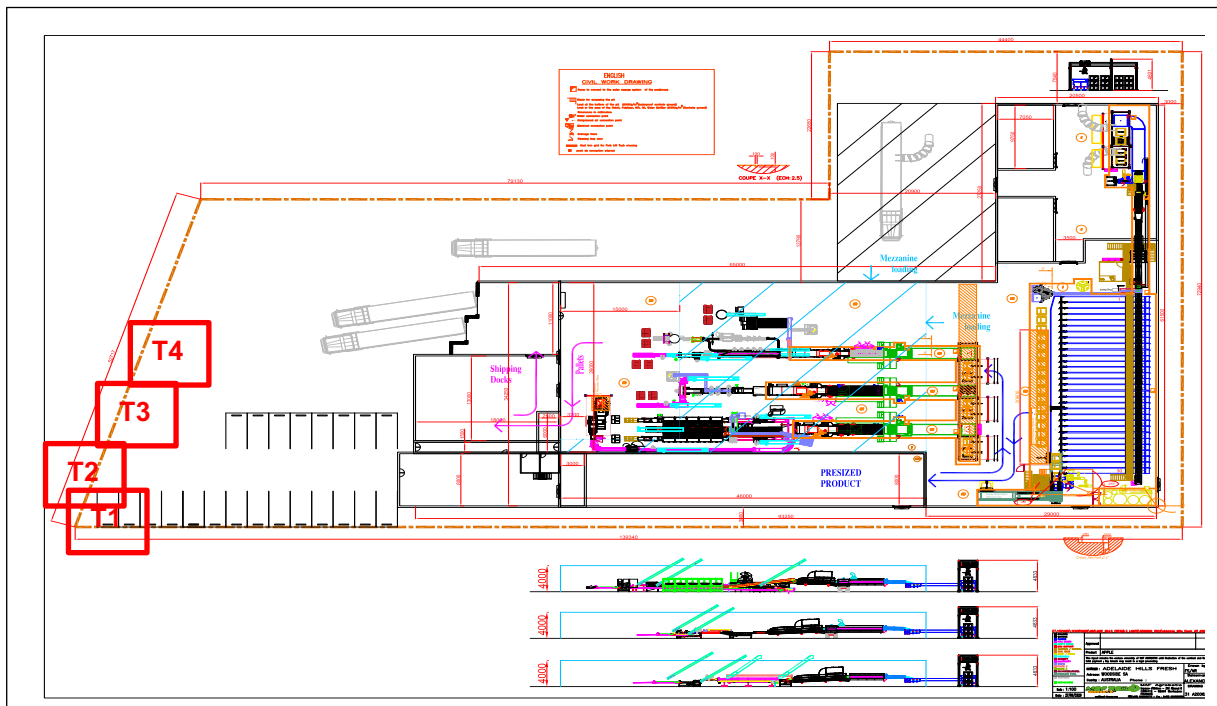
shows the proposed new plans for the Packing Facility of 202 & 204 Onkaparinga Valley Road, Woodside SA 5244.
